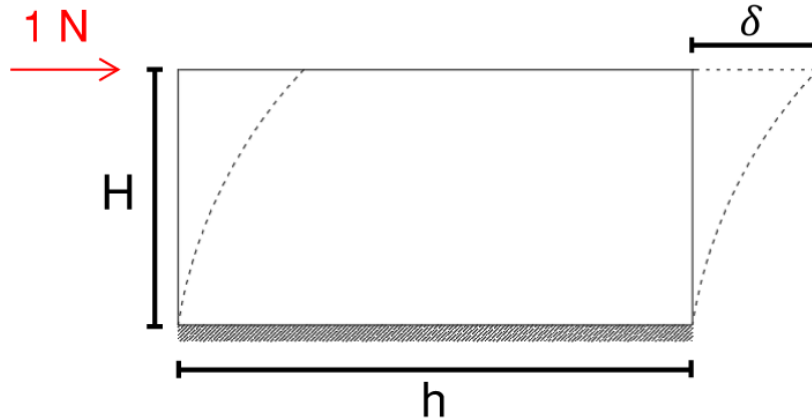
Load model used to calculate deformation of shear wall. Unit load of 1 N subjects the wall.
